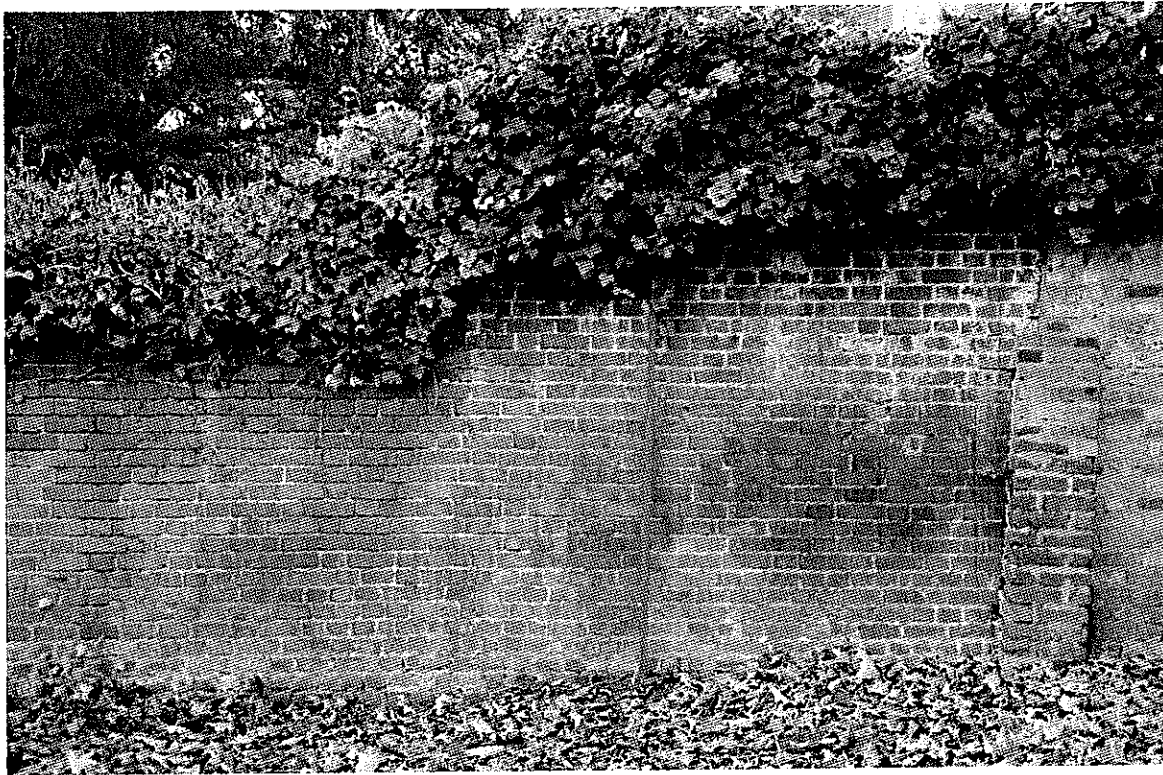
Northern end of the long western wall showing rise and buttress marking newer section to right.
